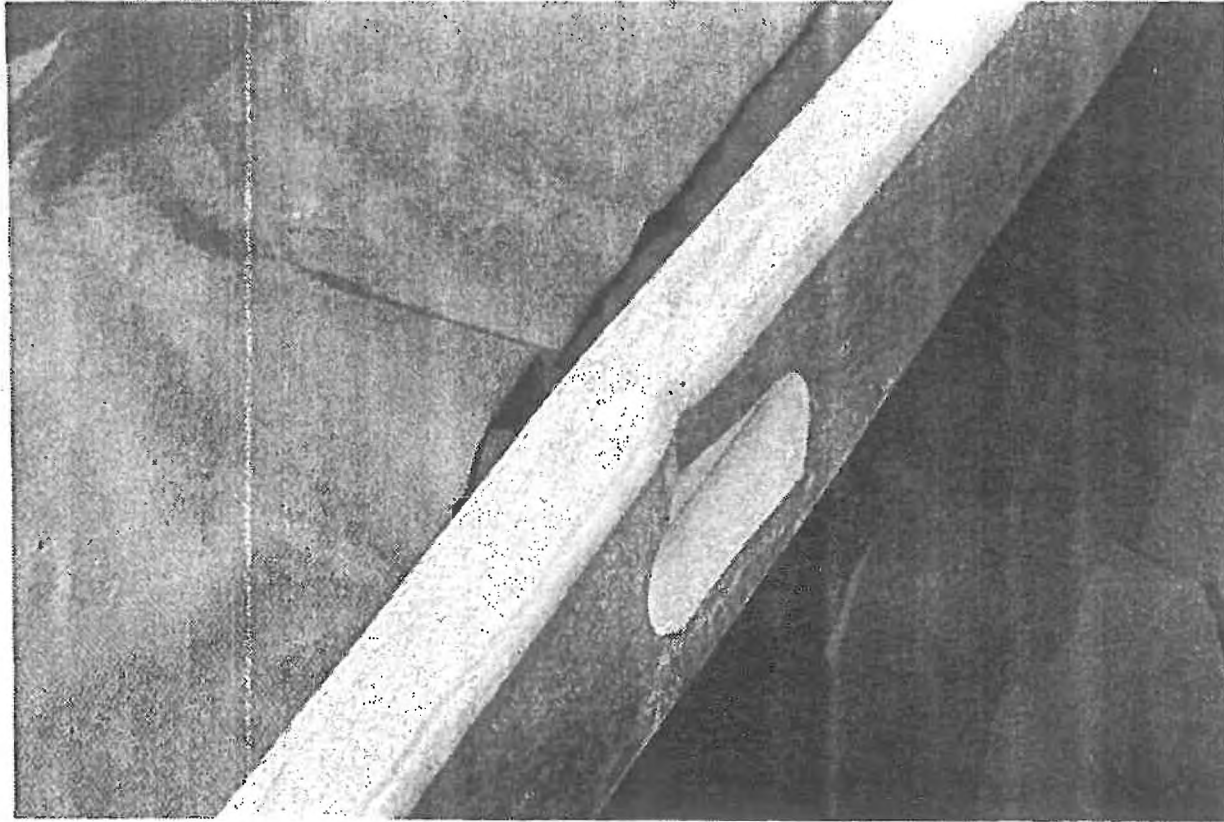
Photograph of Typical Local Buckling Failure of Interior Steel Stud - Series 1
